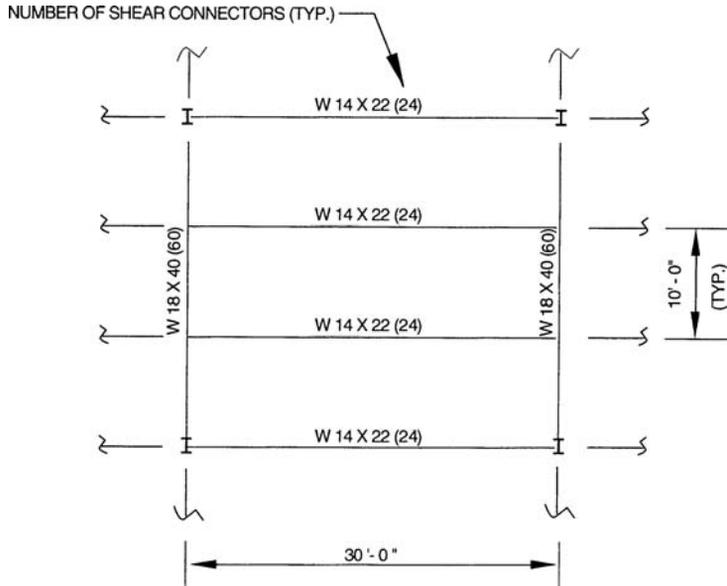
Sizes computed by LRFD for beams and girders for a 30-ft x 30-ft interior bay of an office building.
